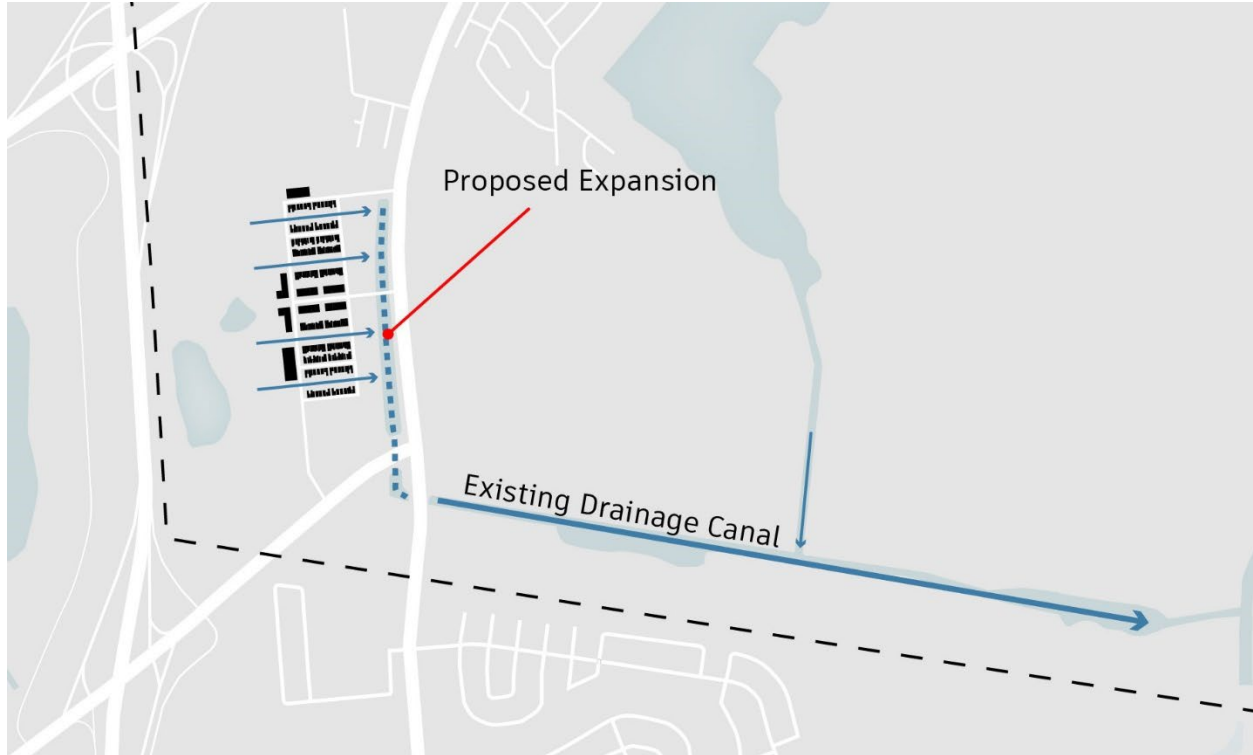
Proposed drainage additions to the plan. (Source: Author)
